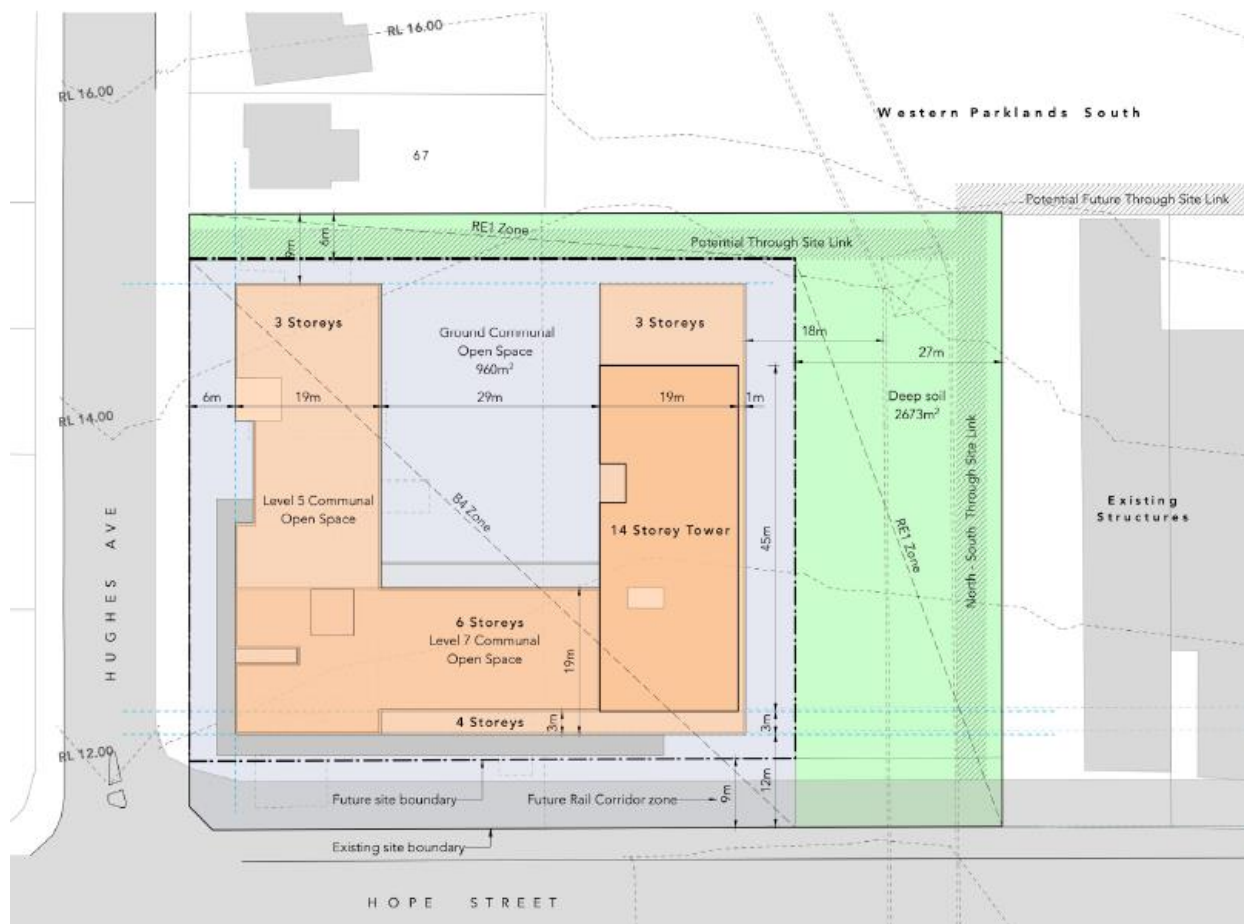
Tomola site concept design. The green areas are proposed new public open space.
